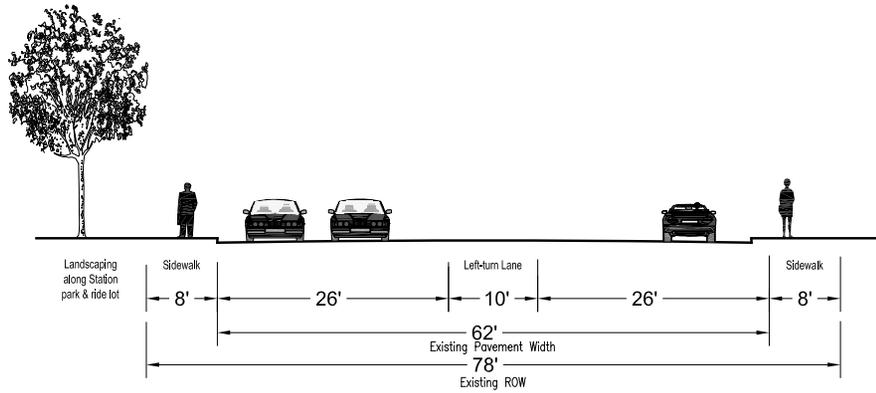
TYPICAL SECTION - RESIDENTIAL
